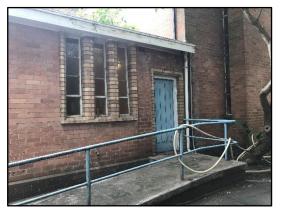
External view to the rear façade of the RPA chapel and viewing room as viewed facing west.
